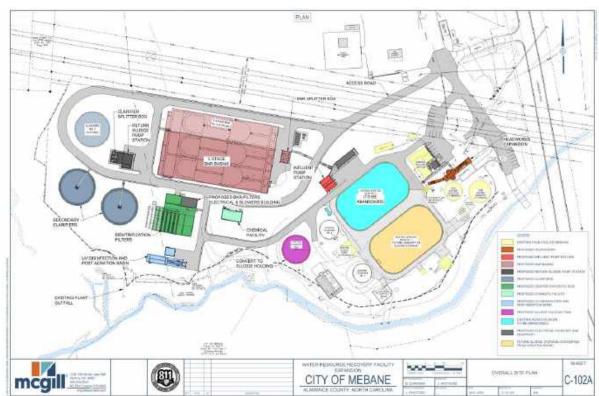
Proposed WRRF Expansion to 4.0 MGD and Future to 6.0 MGD
